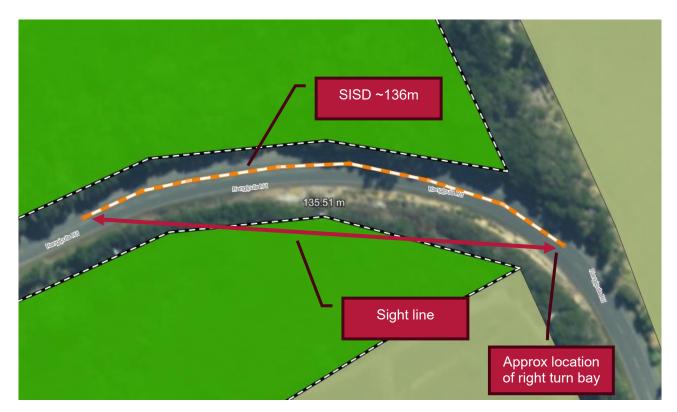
SISD requirement, showing the sight line passing outside of the legal road (adapted from Proposed District Plan map)
